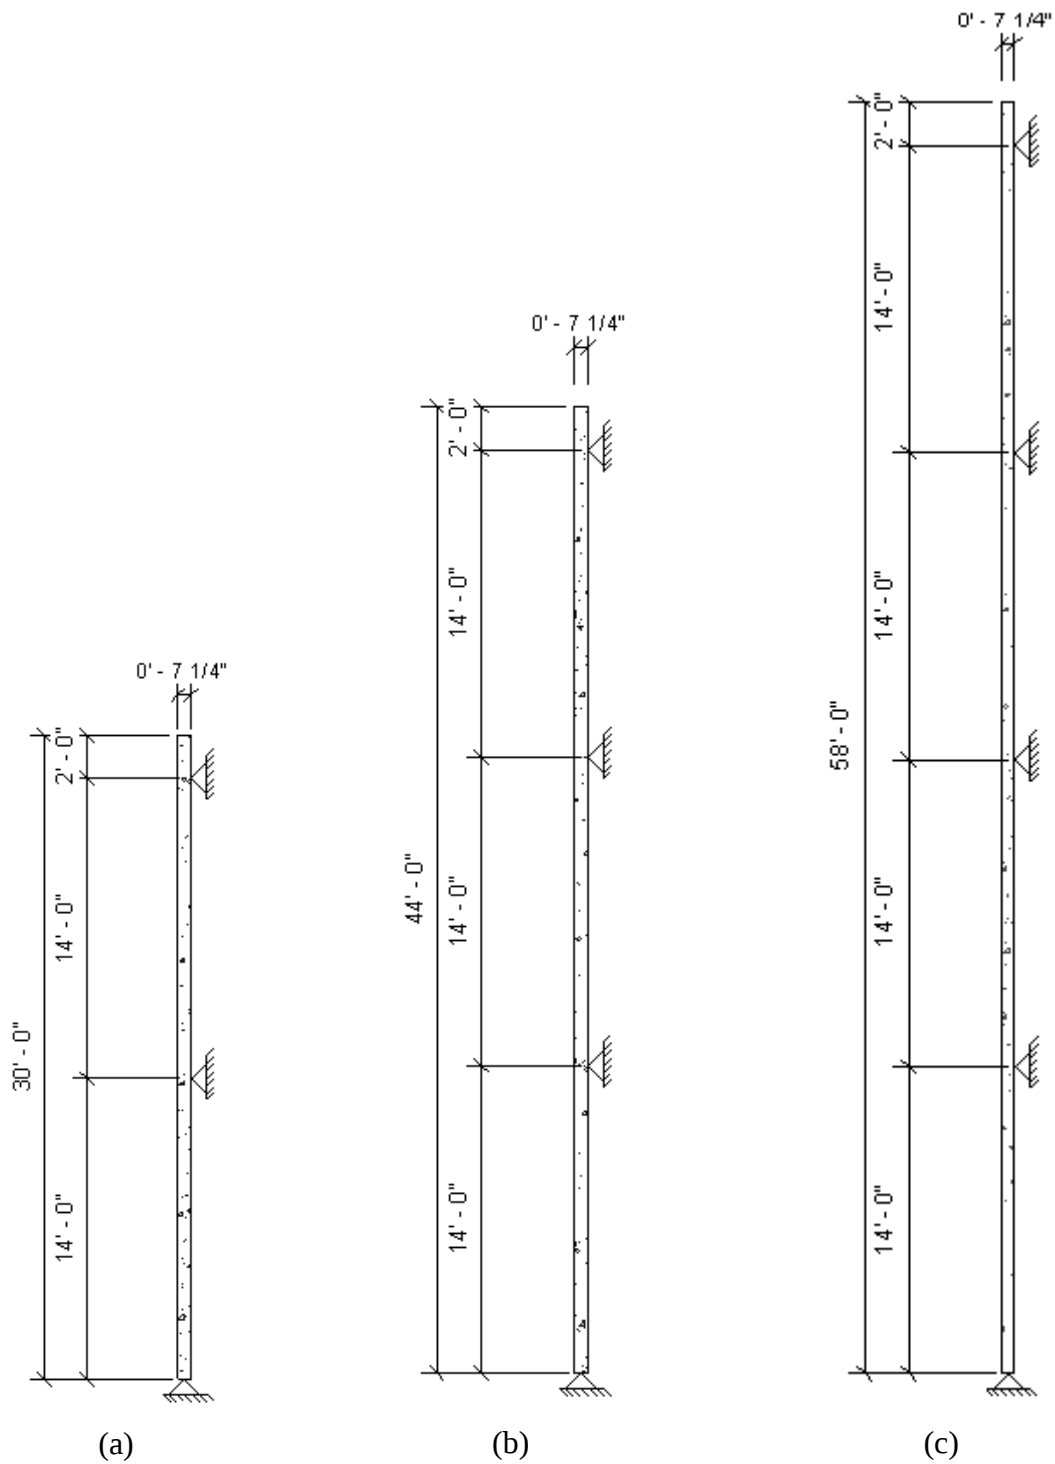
(a) Section of typical 2-story panel, (b) Section of typical 3-story panel, and (c) Section of typical 4-story panel
